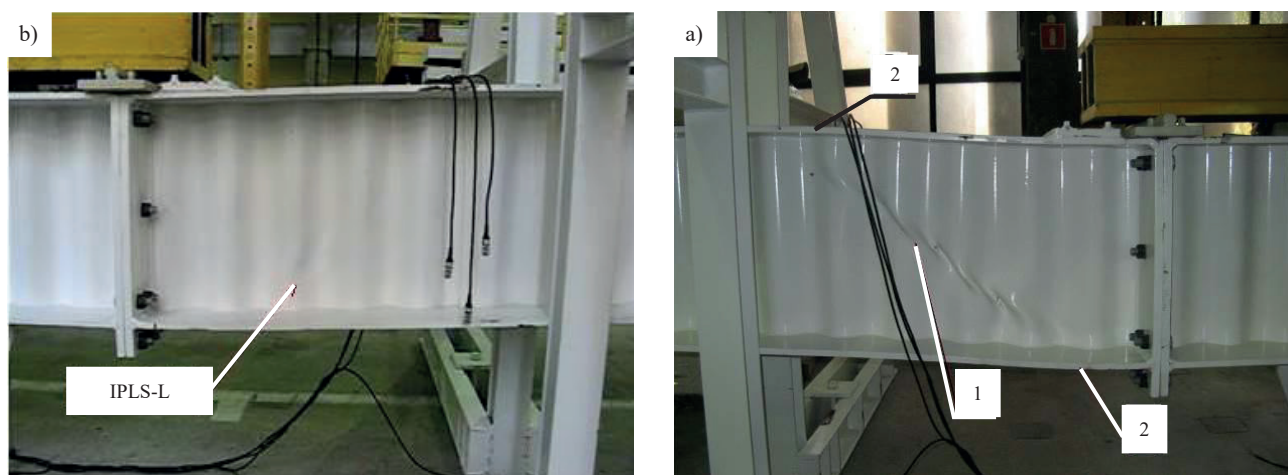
Stages of failure mode of girder with corrugated web 500×2,5 without opening: a) initiation point loss of stability (IPLS – L) of the girder web; b) final failure mode of the girder [10]
